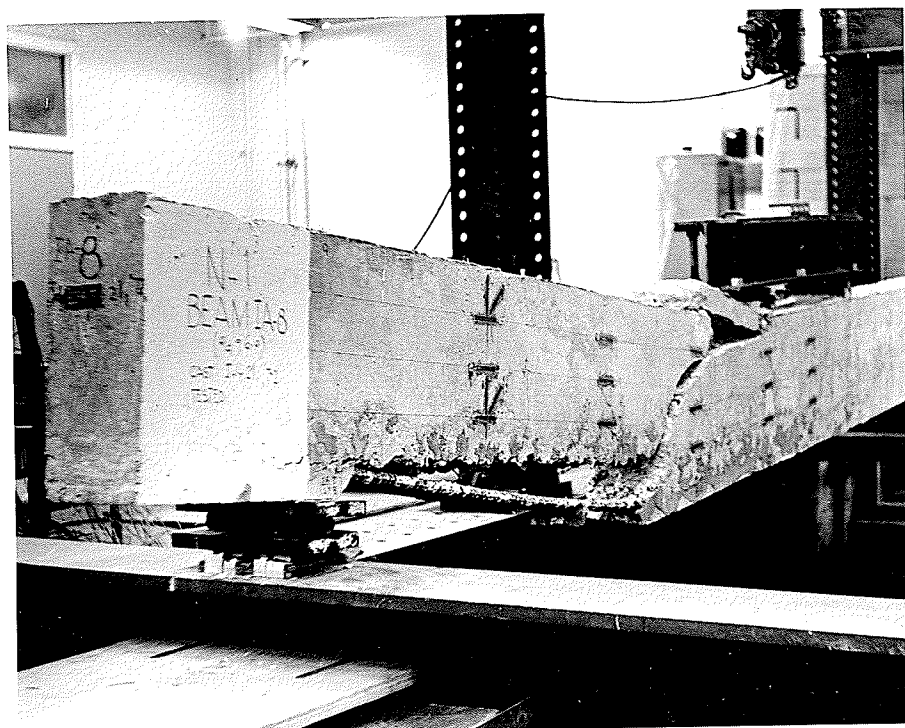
DIAGONAL FAILURE OF BEAM IA-8
